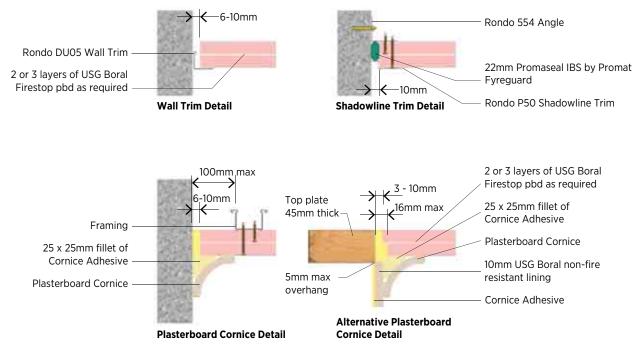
Typical Perimeter Detail - FRL 60/60/60
